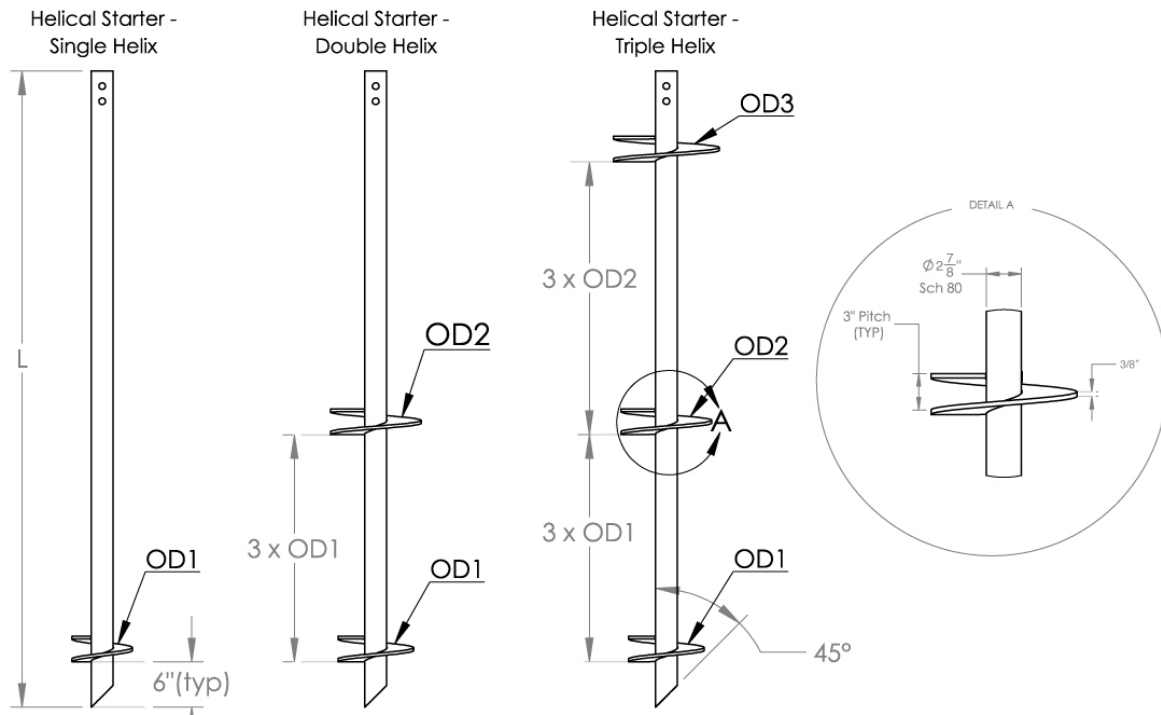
HELICAL PILE STARTER SHAFT – 600-28-S80-#-#-G
